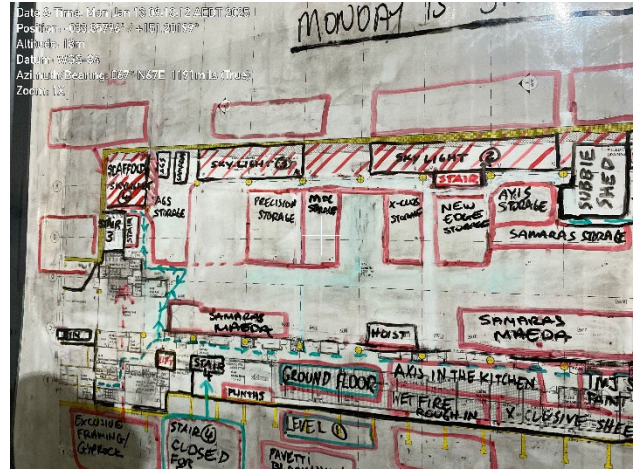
Dynamic site plan discussed at daily coordination meeting. Clear area through middle of plan is designated for construction traffic movement / turning.
